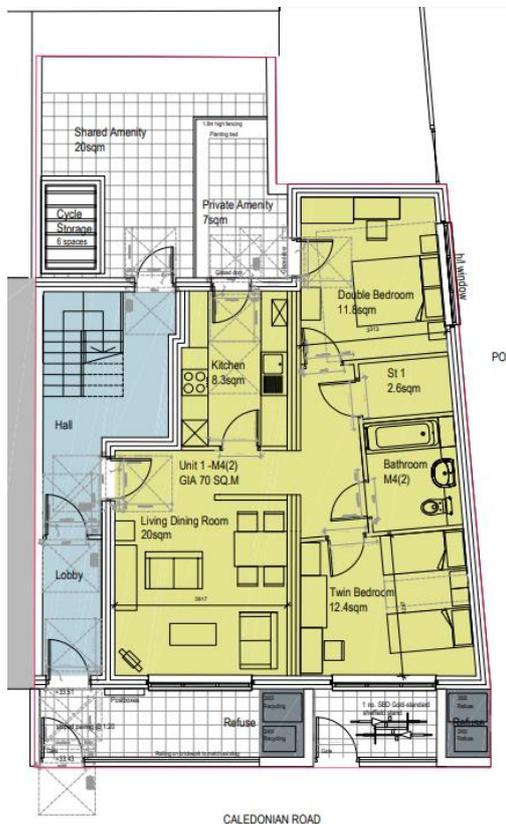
Proposed Ground Floor Plan with Cycle Parking & Refuse Areas
